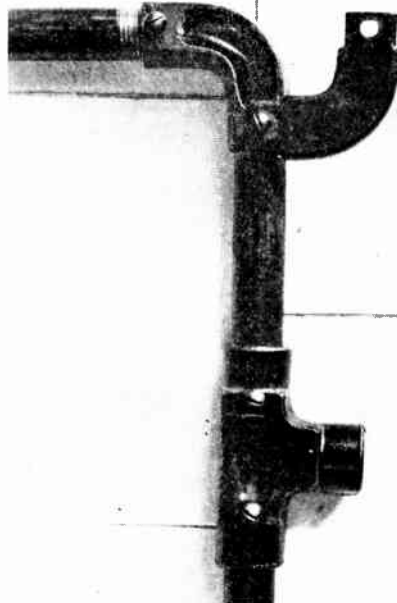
AN INSPECTION ELBOW AND TEE. Note particularly the size of the "inspection" aperture.
